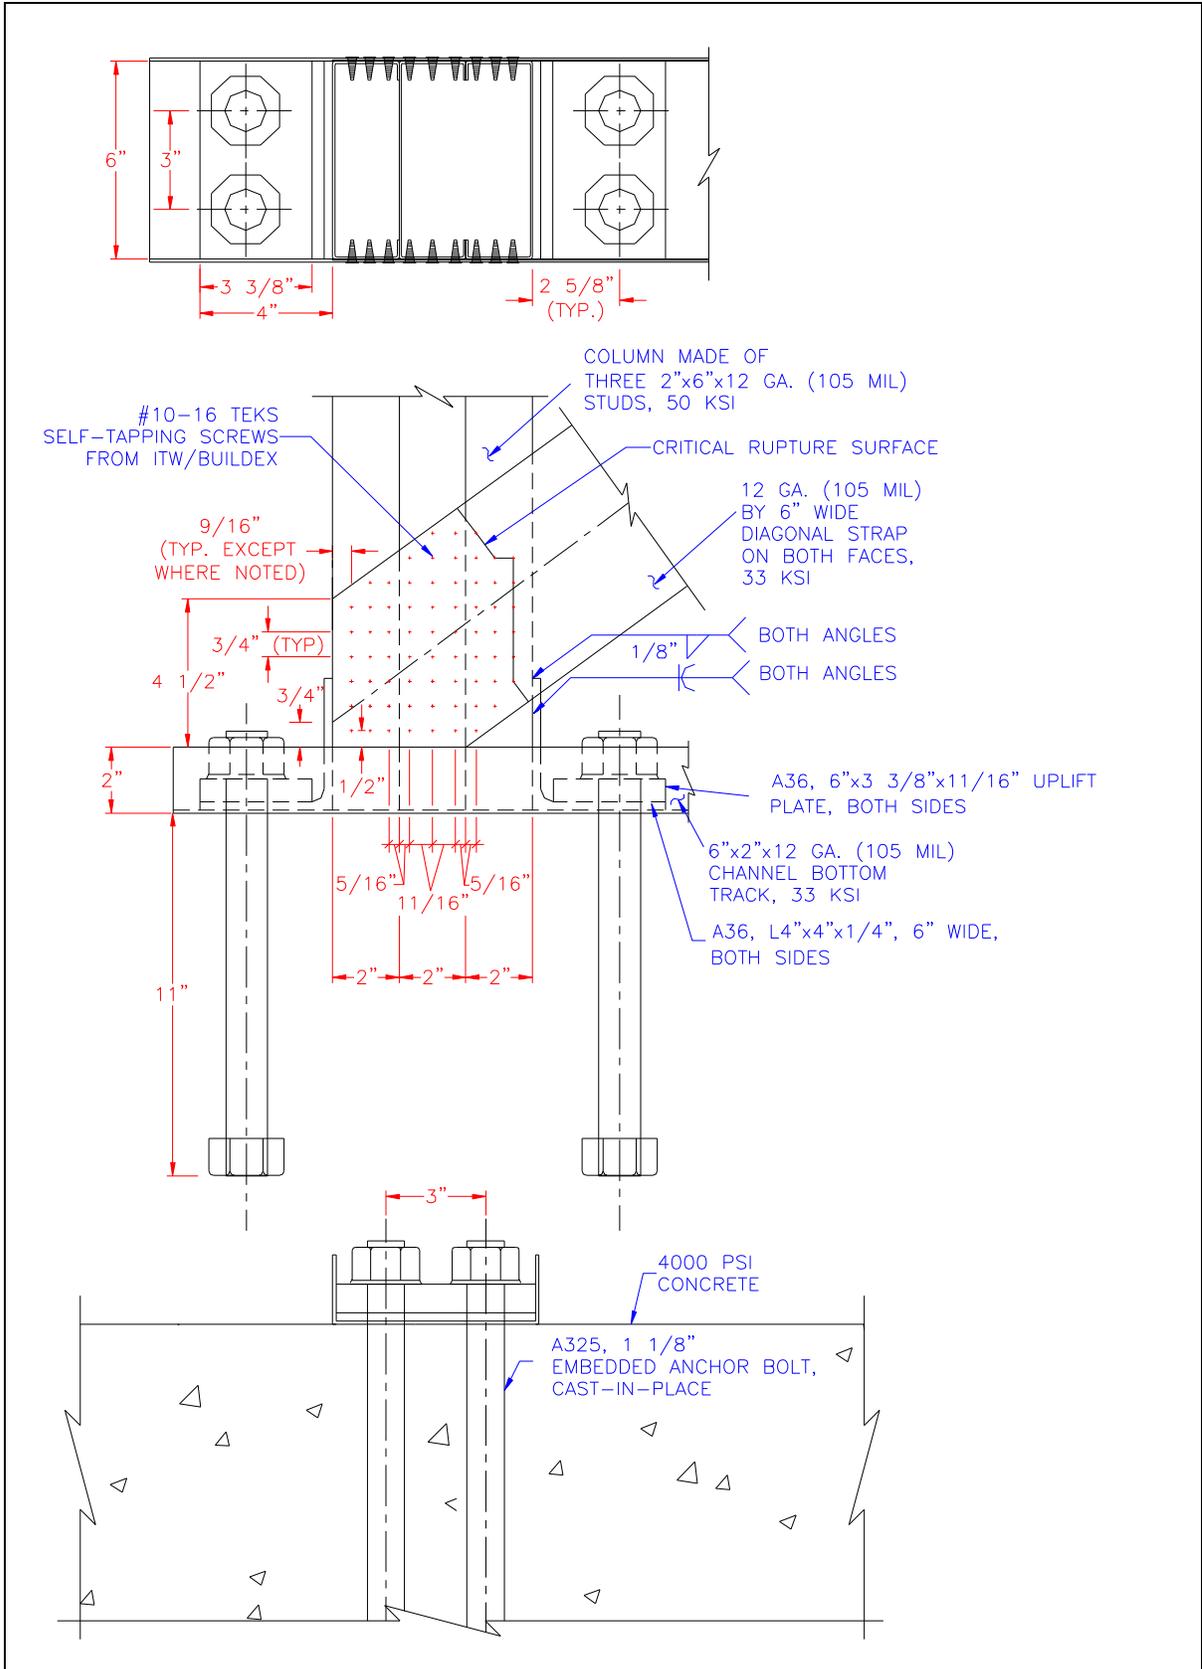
Example connection/anchorage detail - 4th row of Tables D-5, D-8 – D-17.
